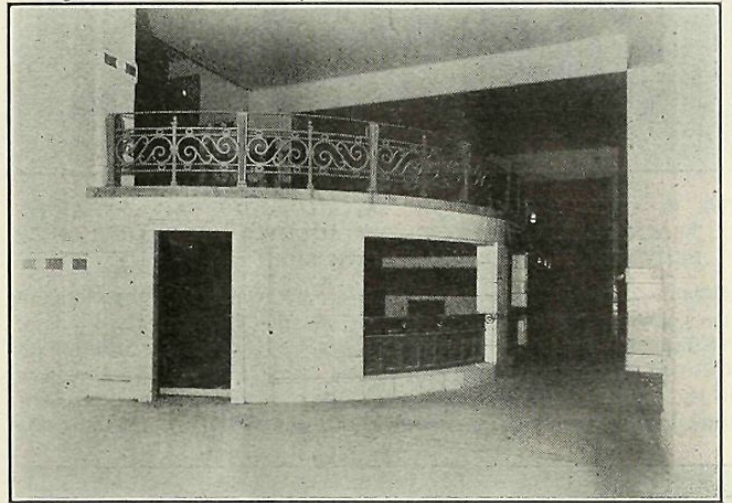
REAR OF STAIRWAY FROM STREET TO TUNNEL STATION, SHOWING BOOTH AND DETAIL OF GRILL AND TILE WORK USED IN ADORNMENT OF PLATFORMS.
